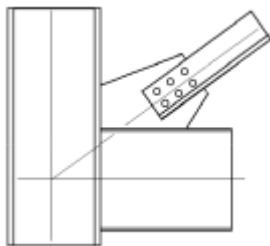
Typical bolted gusset plate brace connection (Roeder et al. 2006).
